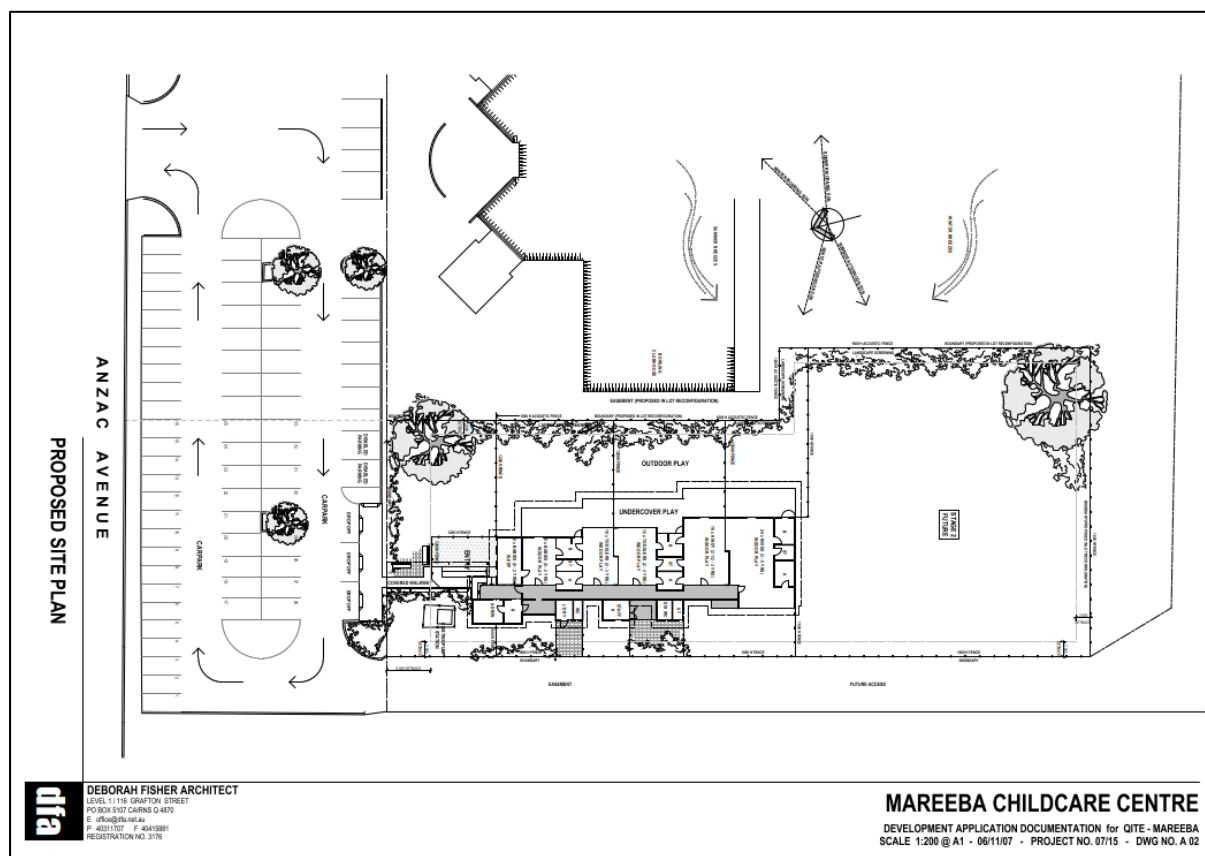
Site Plan - Approval Plans (Source: Deborah Fisher Architect 2007)
